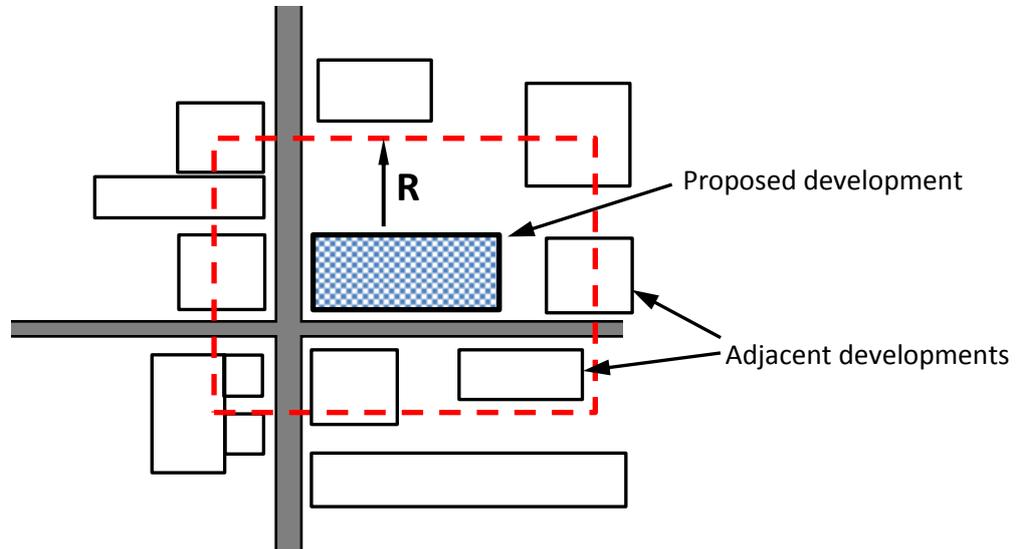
Schematic plan view of a proposed development and existing developments showing the extent of the minimum recommended area to be considered in the pedestrian wind assessment.
